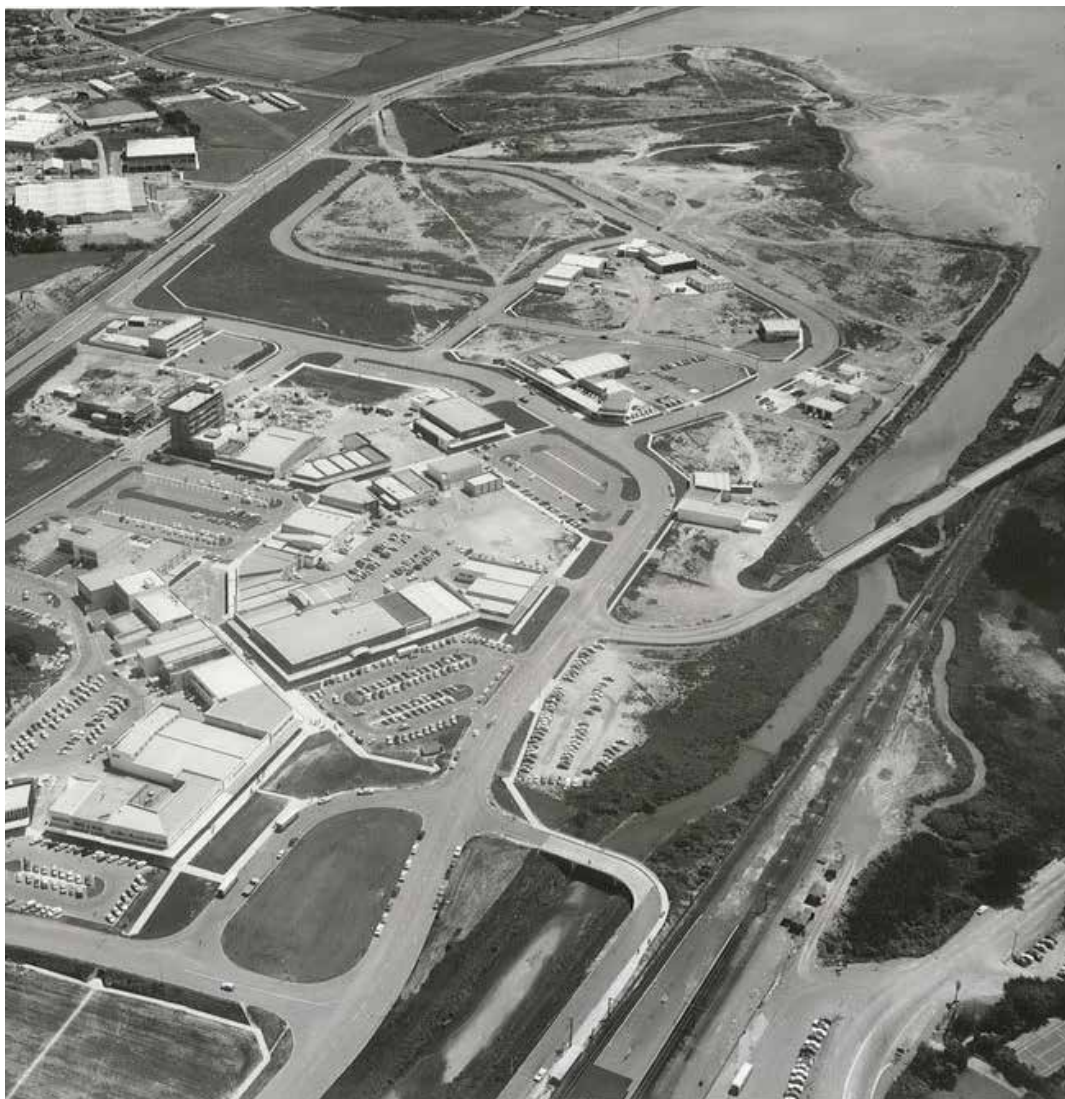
1965 Aerial view of reclaimed land being constructed.
